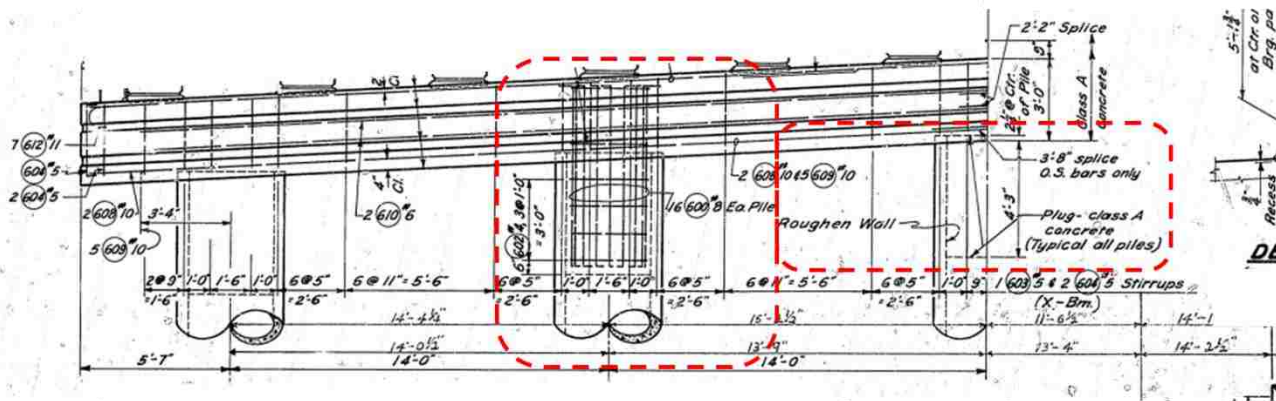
Details of inner plug reinforcement (Galer-Lakeview)
